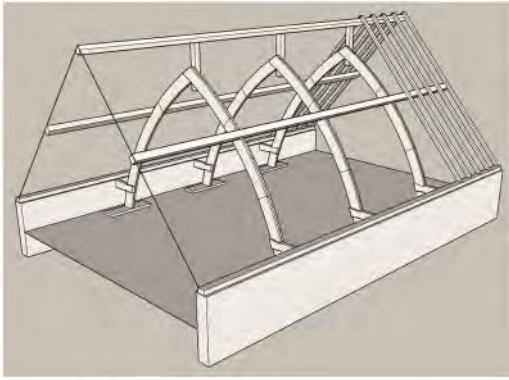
Modern 19th-century roof construction with Philibert trusses. Leiden, Maredijk 36, 1840 (ELO, E.D. Orsel).
